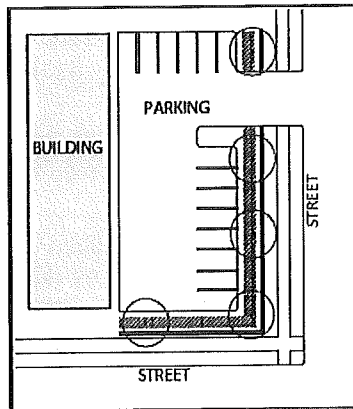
Landscaping Buffer with Evergreen Plantings—Plan View
